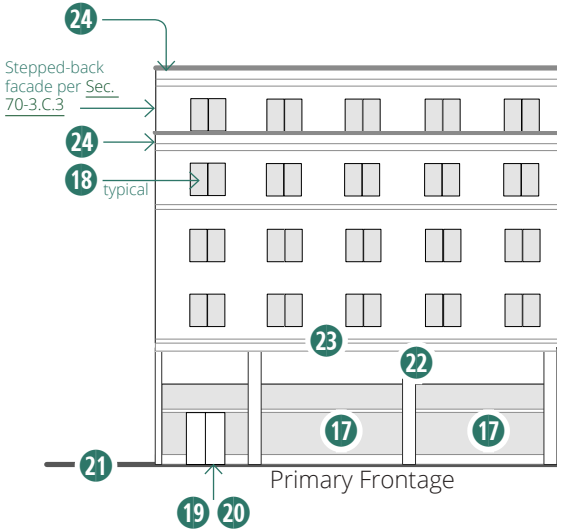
C-4. Storefront Building Elevation: Facade Design Requirements
